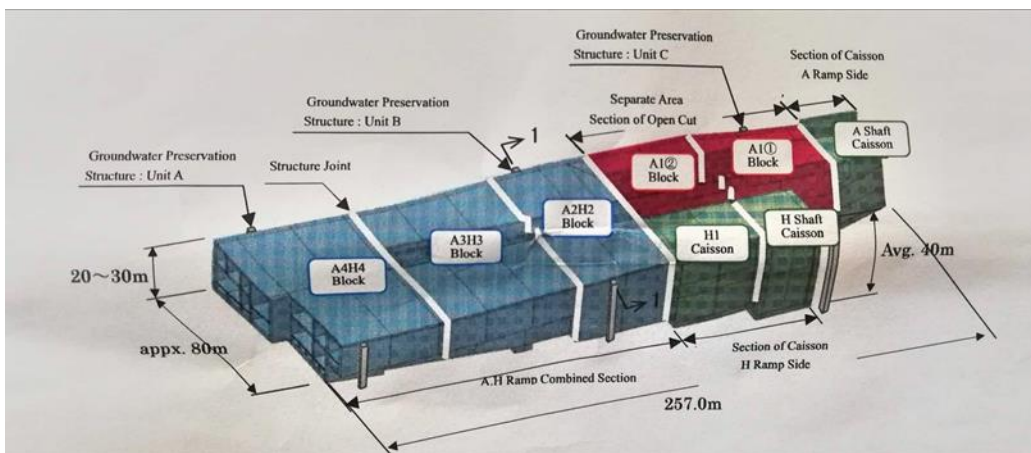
General View of the Structure of Tokyo Outer Ring Road JCT North Ramp Project
